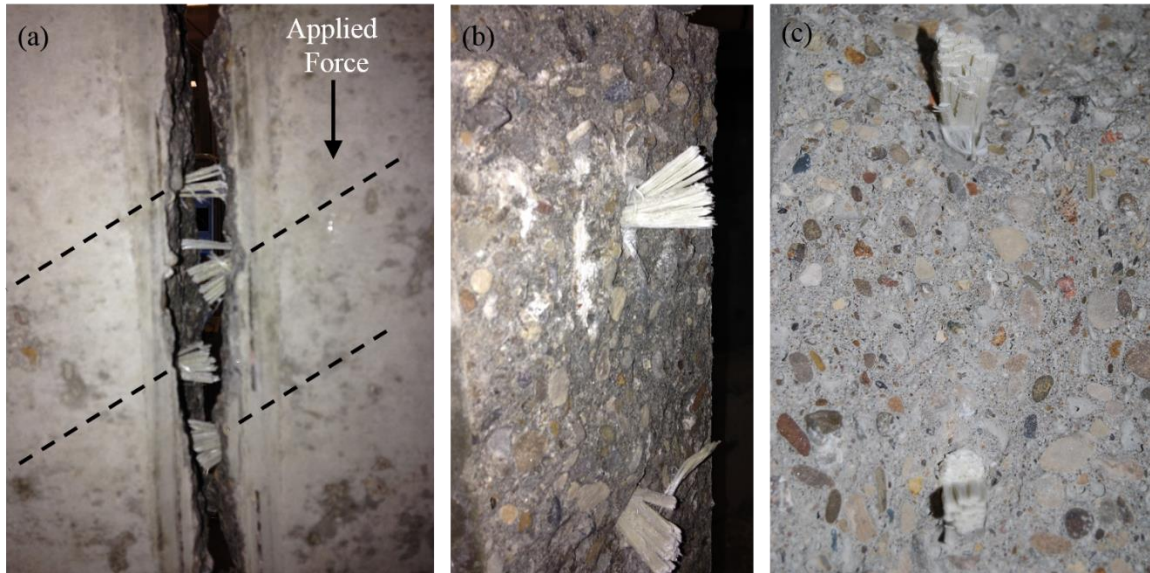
Failure of 45-degree Two-Bar Specimen: (a) Side View of Crack Plane Specimen G2I-45; (b) Crack Plane of Specimen G2I-45; (c) Crack Plane of Specimen G2II-45
